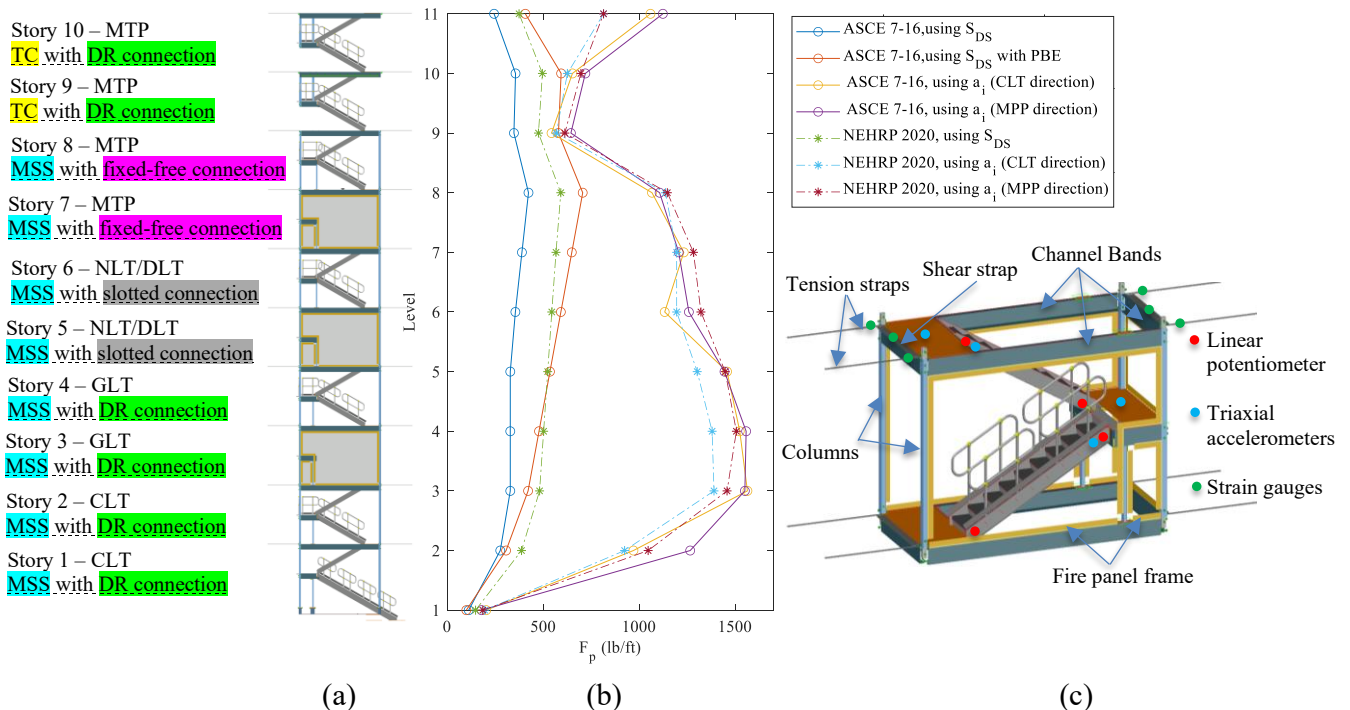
(a) Stair tower (b) stair seismic design force  $F_p$  (c) MSS (Image courtesy of Construction Specialties.)
